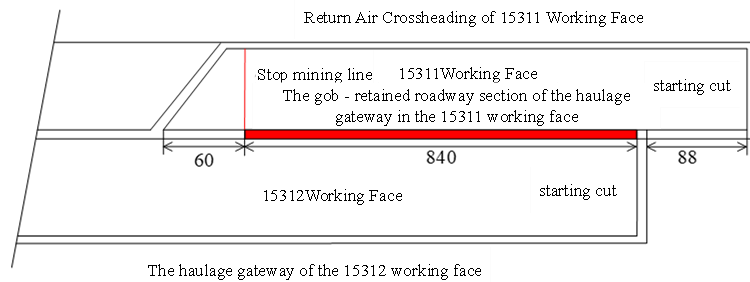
Construction Layout of Gob-side Entry Retaining with Coal Gangue Concrete in the 15311-Working Face
